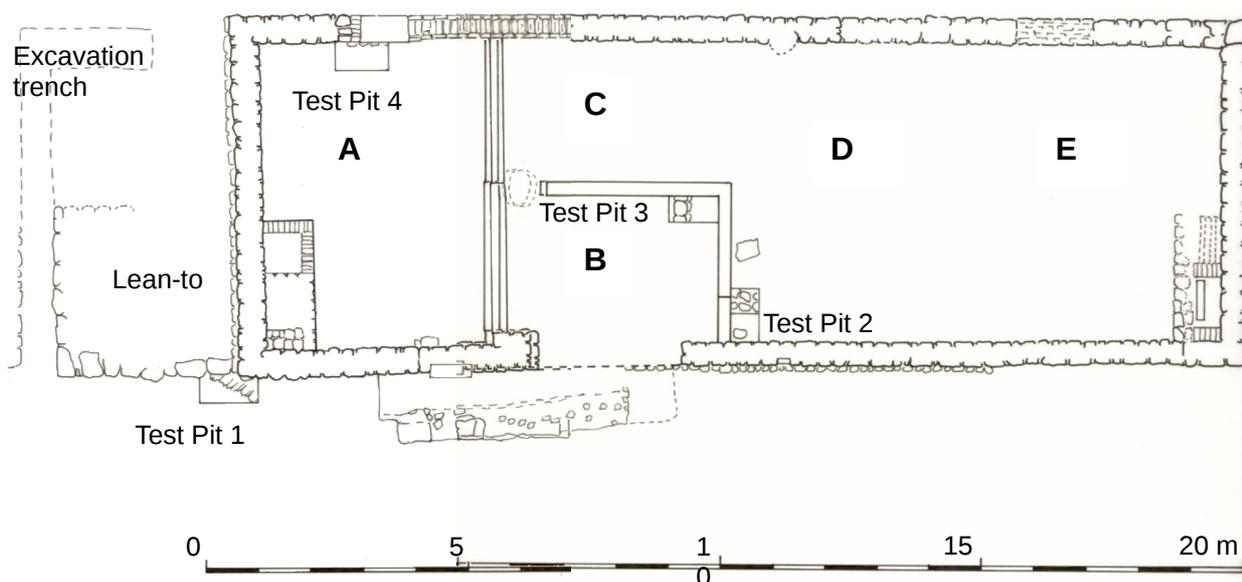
Floor plan of Skuifraam-1 drawn facing east. Letters A-E indicate possible rooms. The walls between Rooms C, D and E have not been preserved.
